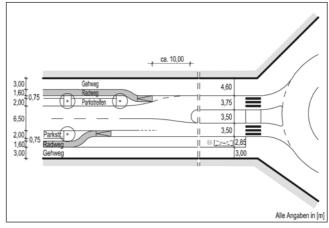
Example of a carriageway widening, with central island and bus stop, before a small roundabout
